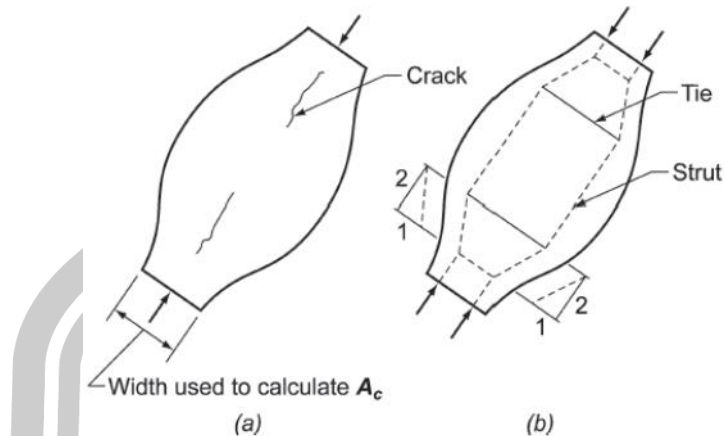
Bottle-Shaped Strut: (a) Cracking of A bottle-Shaped Strut ; (b) A Model to Determine Transverse Tension [3].
